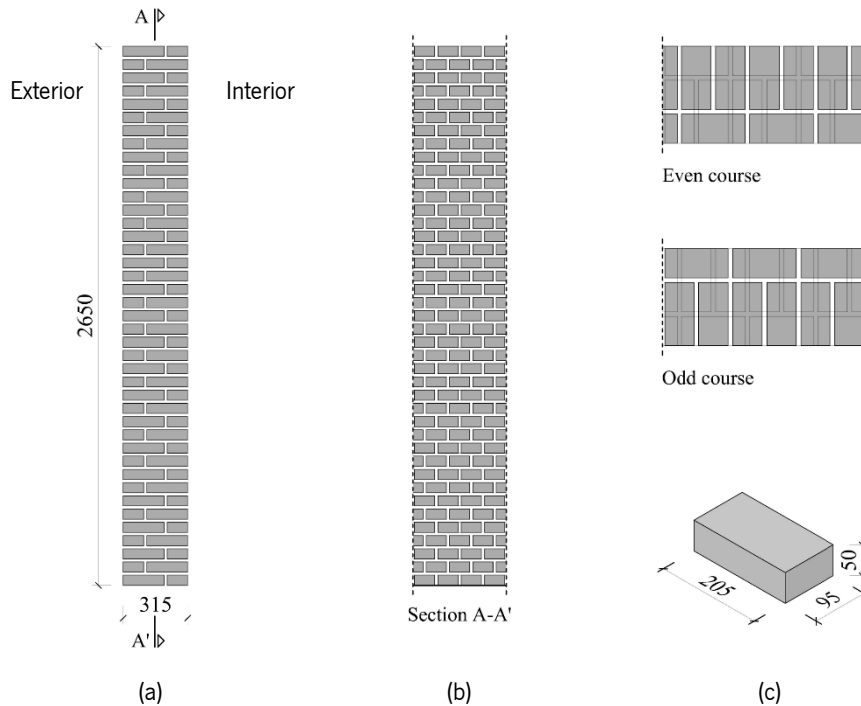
Schematic geometrical configuration of the brick masonry wall: (a) transversal cross–section; (b) vertical cross–section; (c) bond arrangement and brick blocks geometry. Dimensions in mm.
